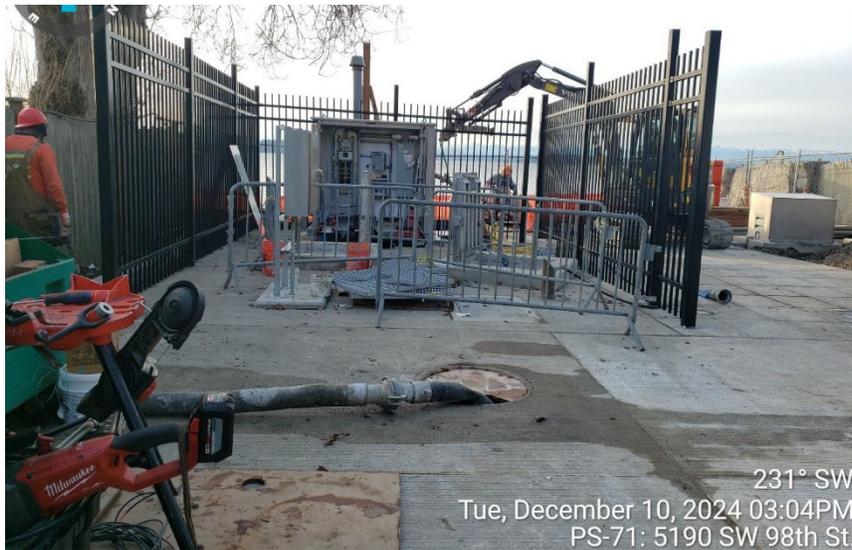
Site Work in Progress at Wastewater Pump Station 71
